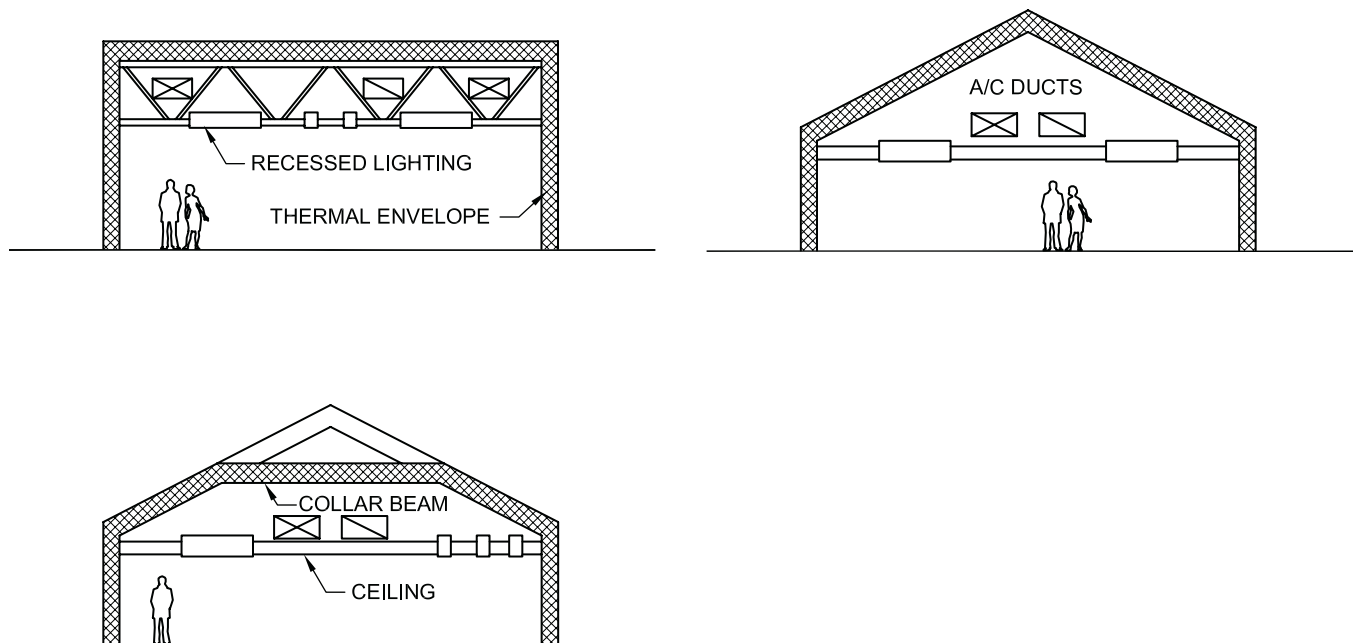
For flat-roofed buildings, the insulation should be on top of the roof deck so that all ducts, lights, and structural members are on the indoor side of the thermal envelope. Codes no longer allow placing insulation on top of hung ceilings. On sloped roofs, the insulation should follow the roof rafters and be placed between the rafters and/or on the roof deck. For steeply sloped roofs, the insulation can follow the collar beams, if they exist.
